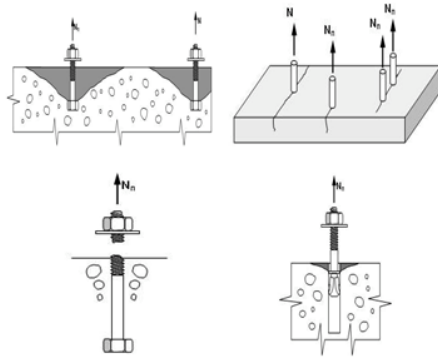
Tensile Failure Mechanism for Post-Installed Anchor Systems
